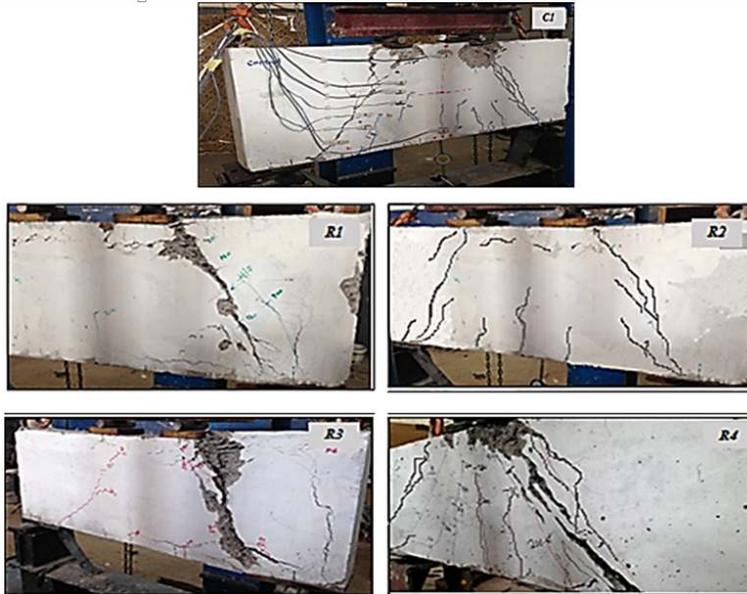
Failure mode for Beam Specimens C1, R1, R2, R3 and R4.
